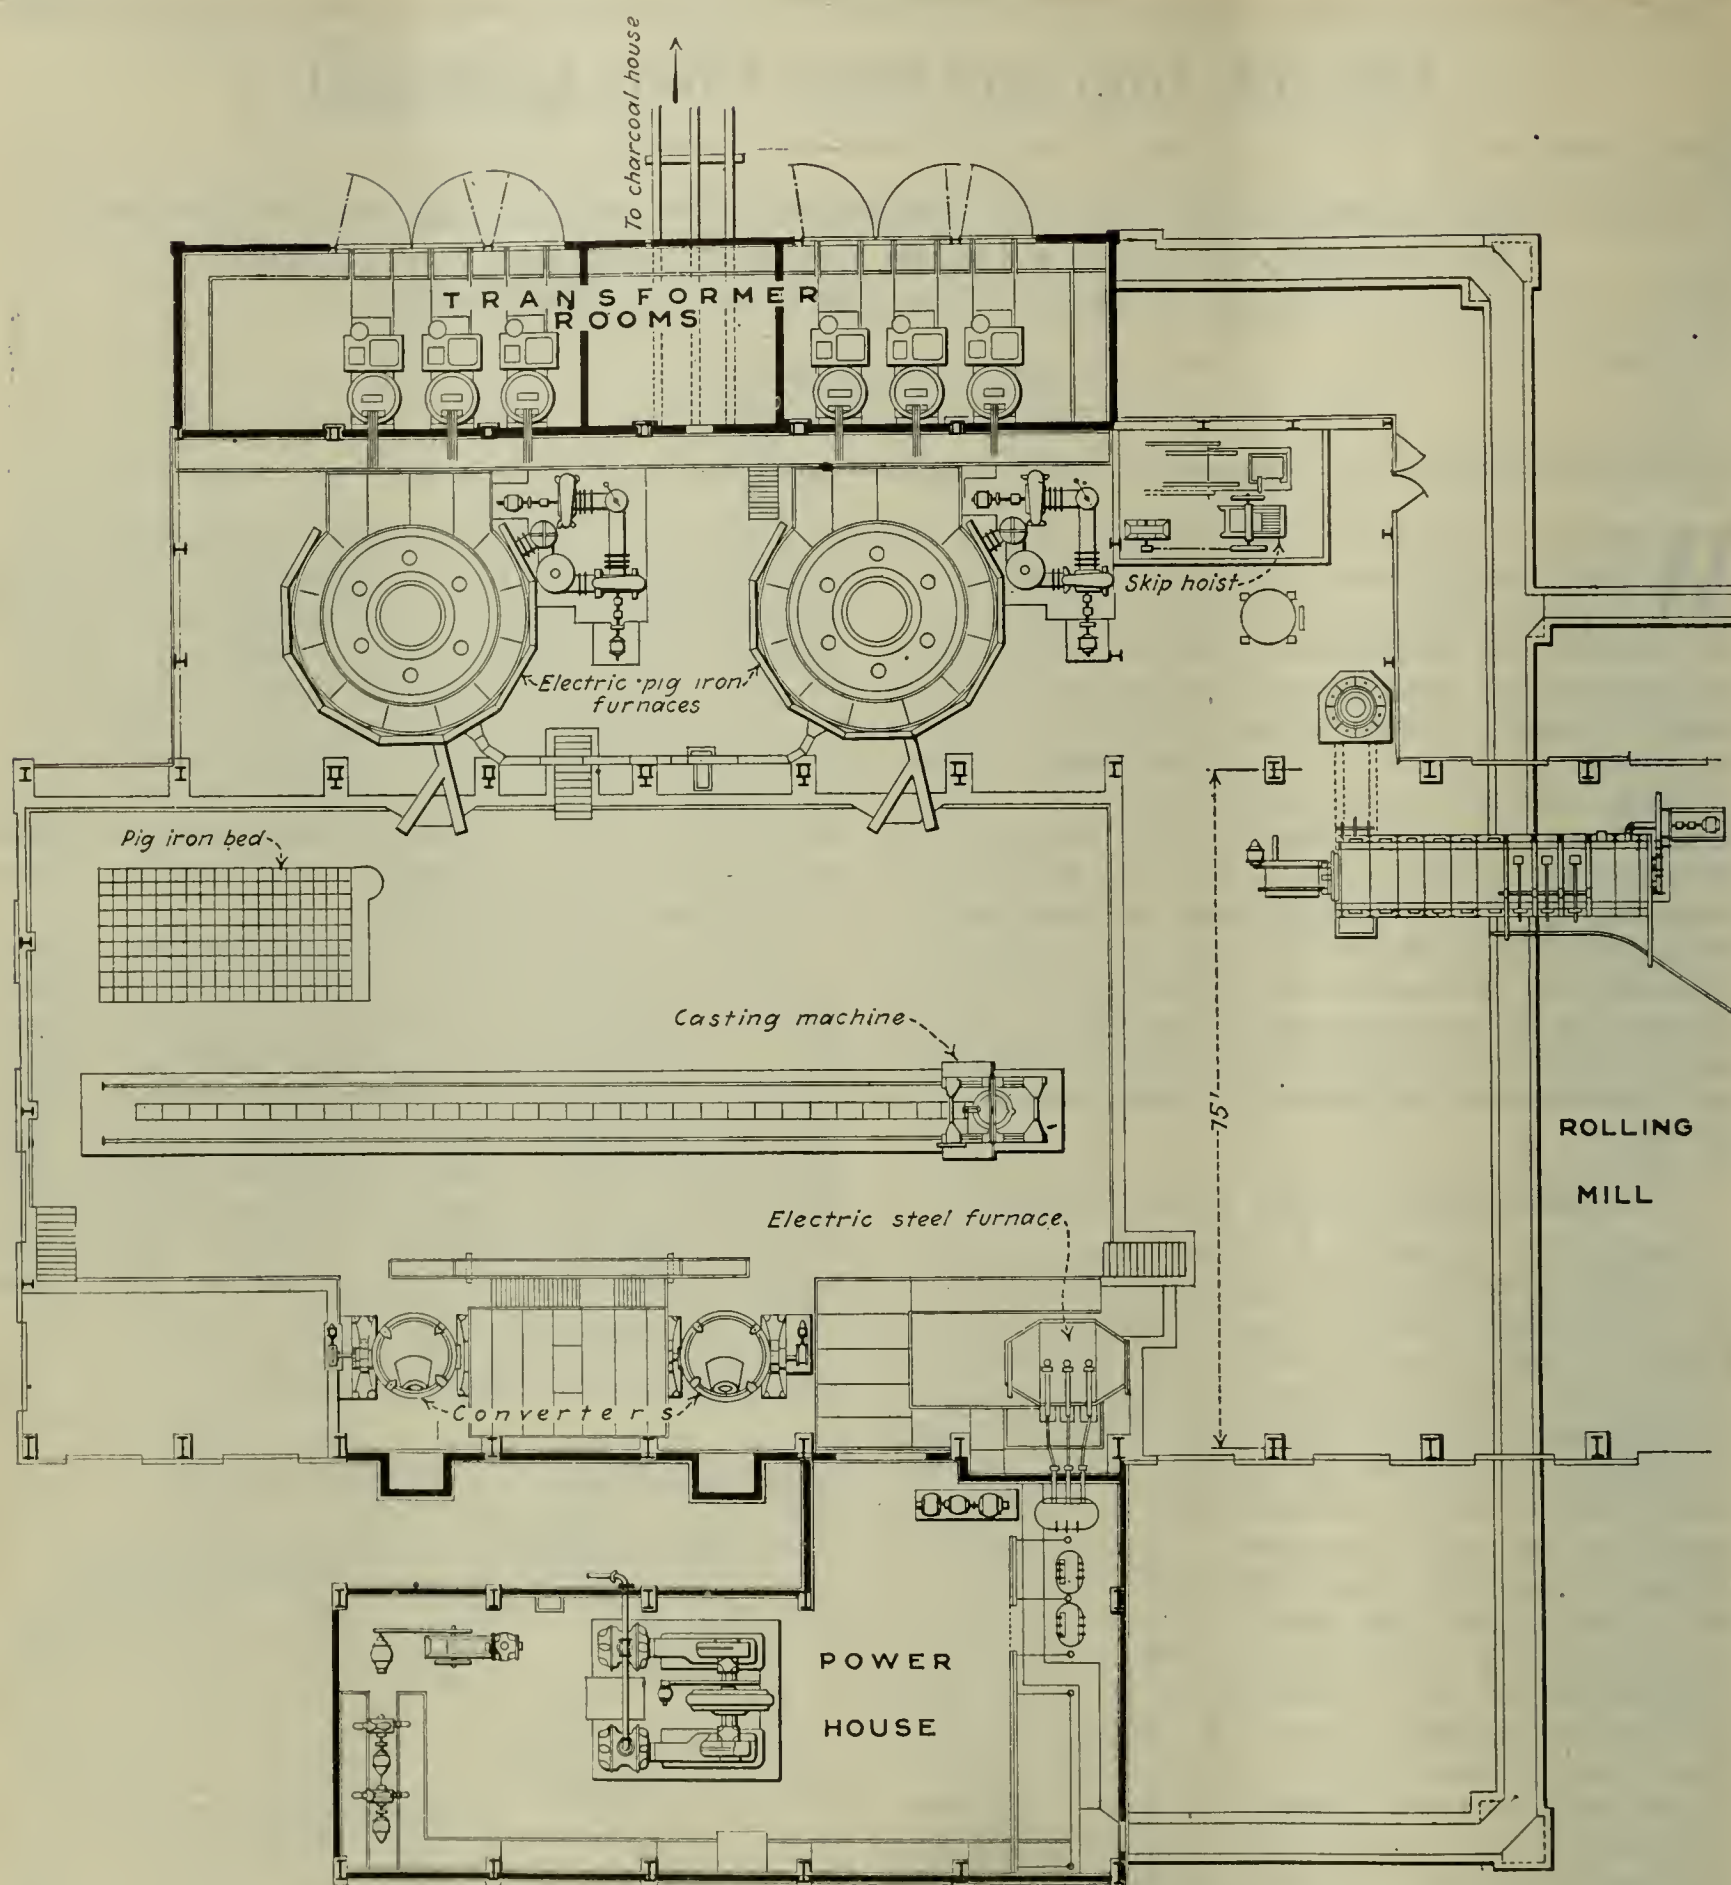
GROUND PLAN OF IRON AND STEEL PLANT
